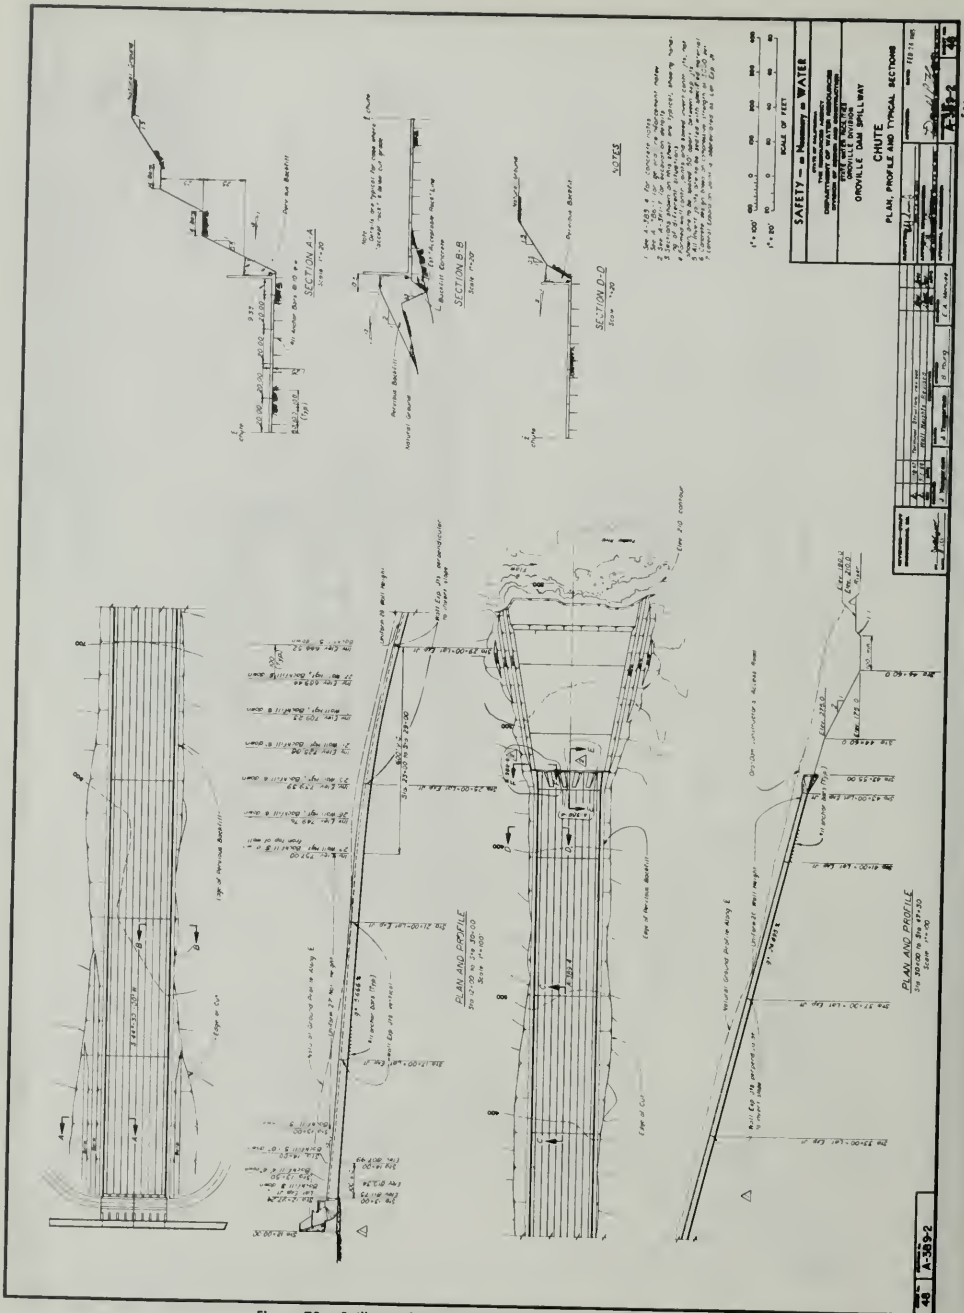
Spillway Chute—Plan, Profile, and Typical Sections
